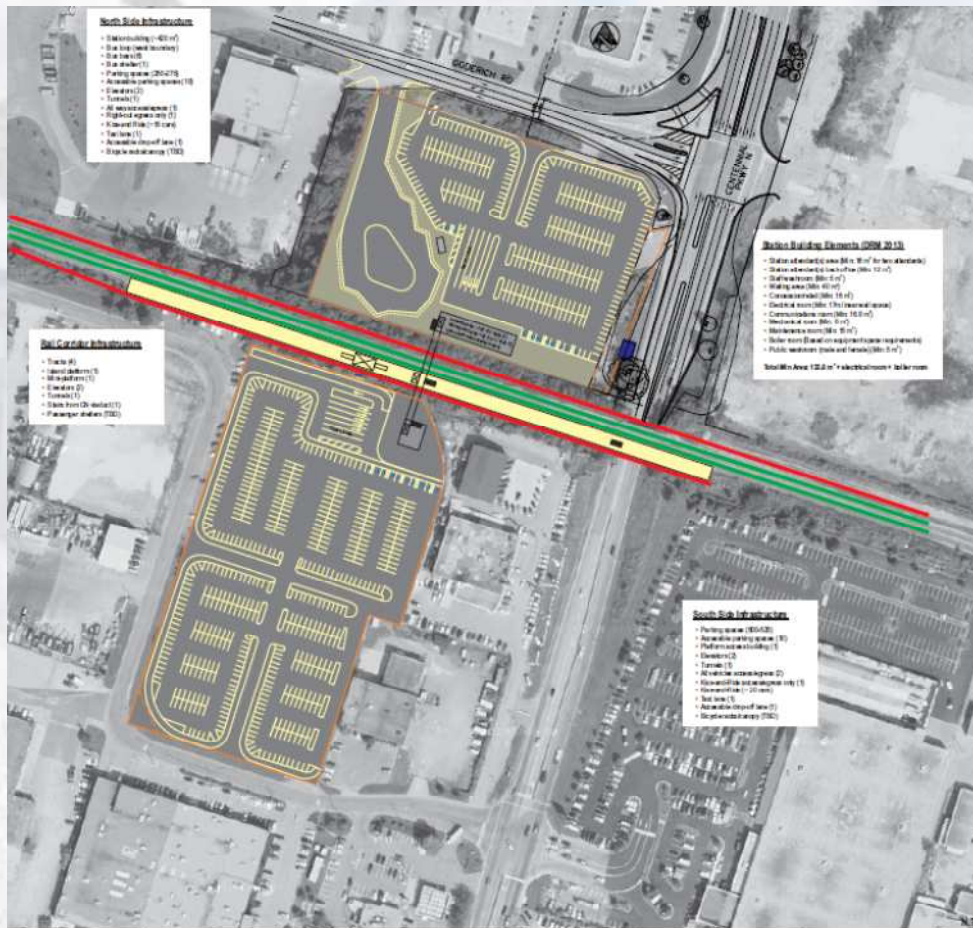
RECOMMENDED RAIL CONCEPT PLAN
